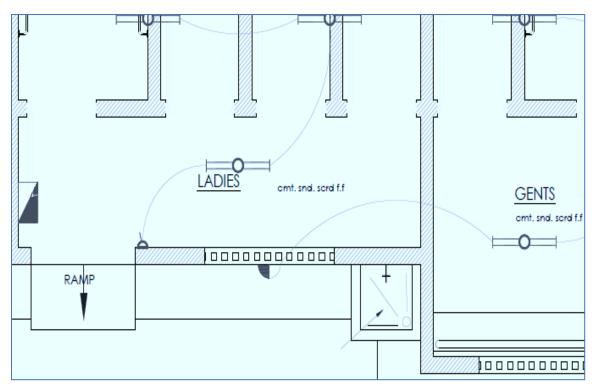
Layout of Proposed Public Water Borne Toilet
